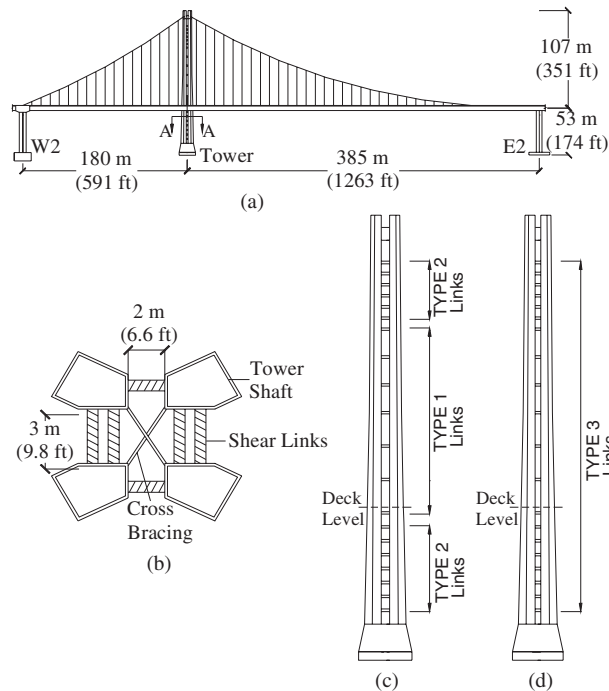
Tower cross-section and elevations: (a) main span elevation; (b) section A–A; (c) transverse tower elevation; and (d) longitudinal tower elevation.
